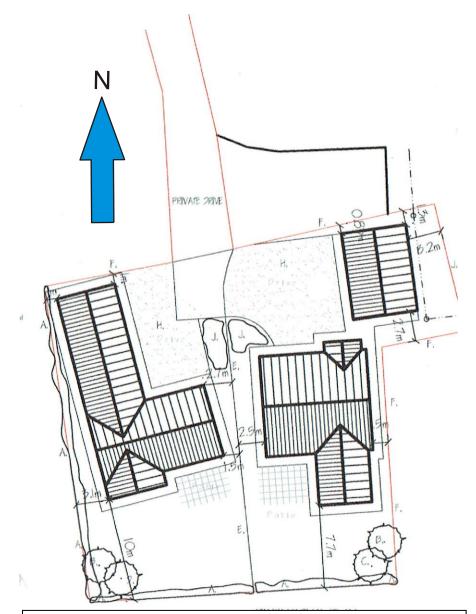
Site location at an original scale 1:500, (not to scale), (extract from Architects plan)
